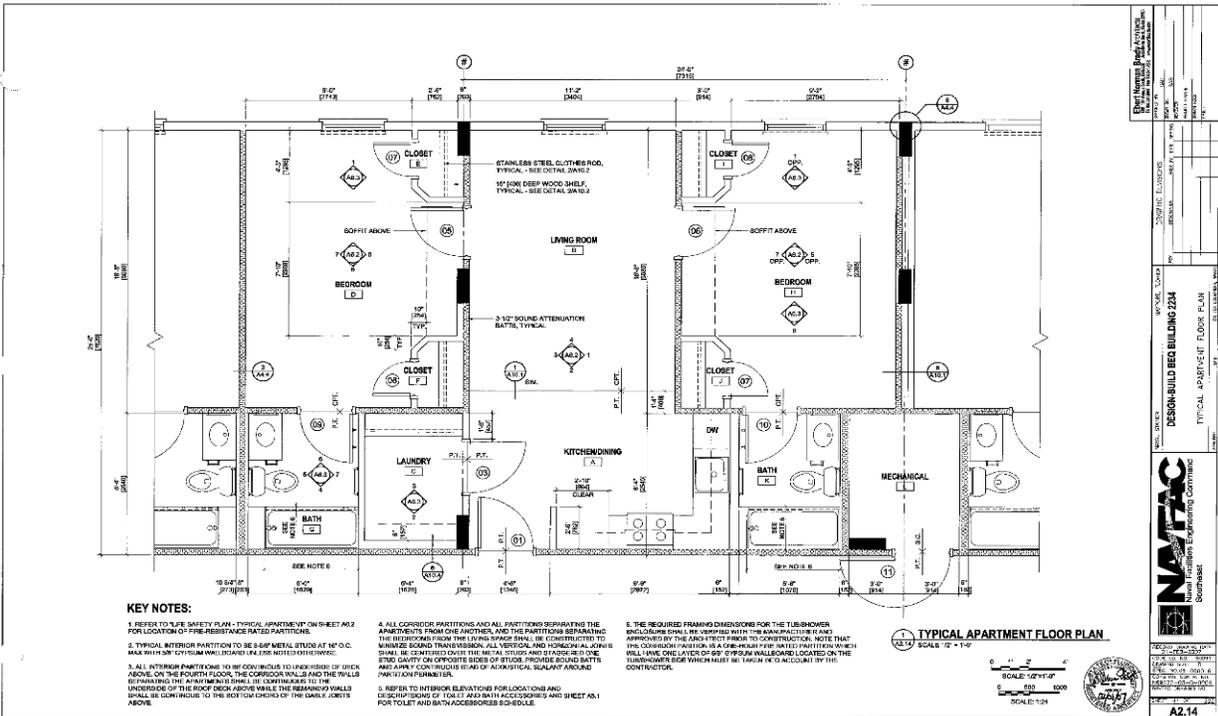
Hampton Roads MILCON Market Style Floor Plan
